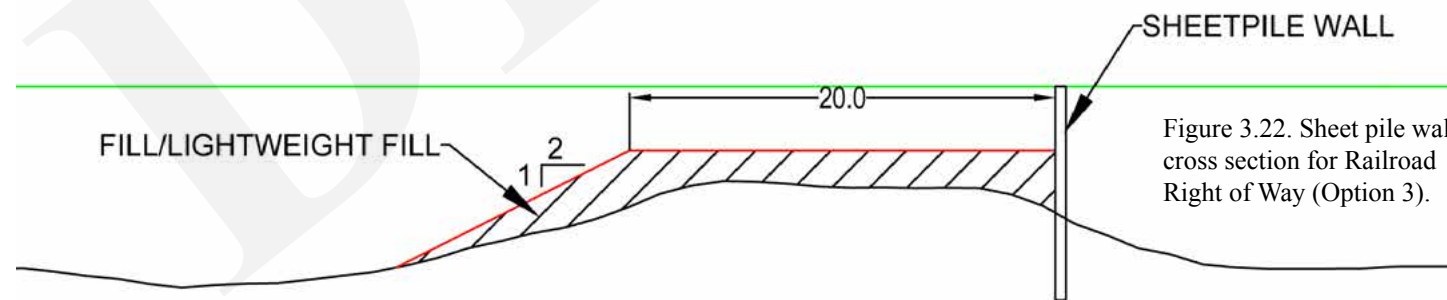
Sheet pile wall cross section for Railroad Right of Way (Option 3).
